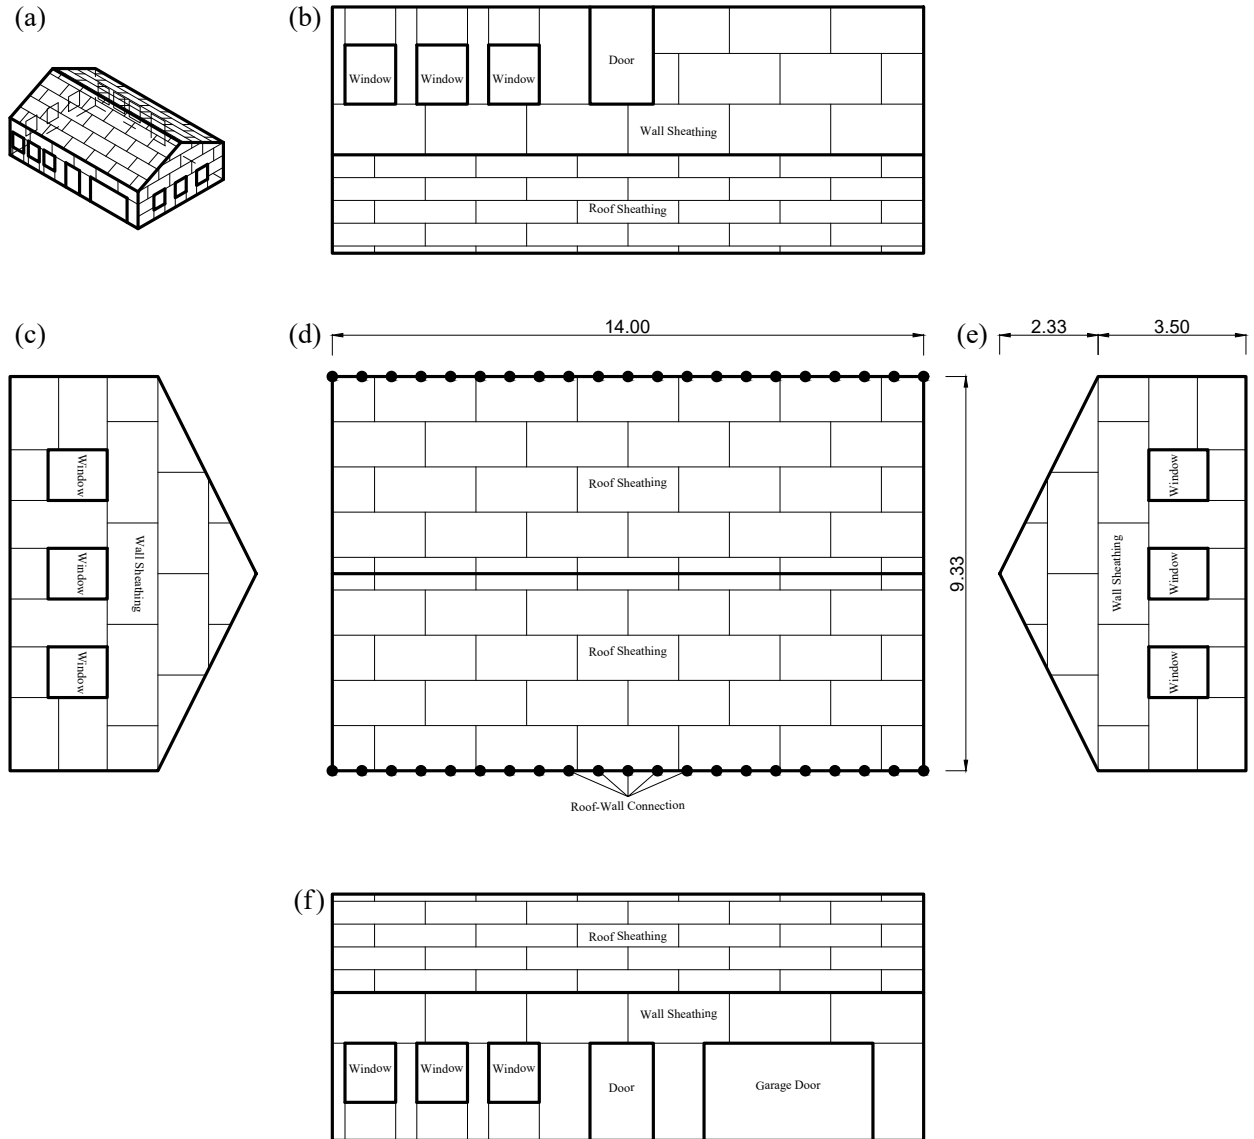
Residential gable-roof building archetype: (a) isometric projection, (b) back view, (c) left-side view, (d) top view, (e) right-side view, (f) front view.
